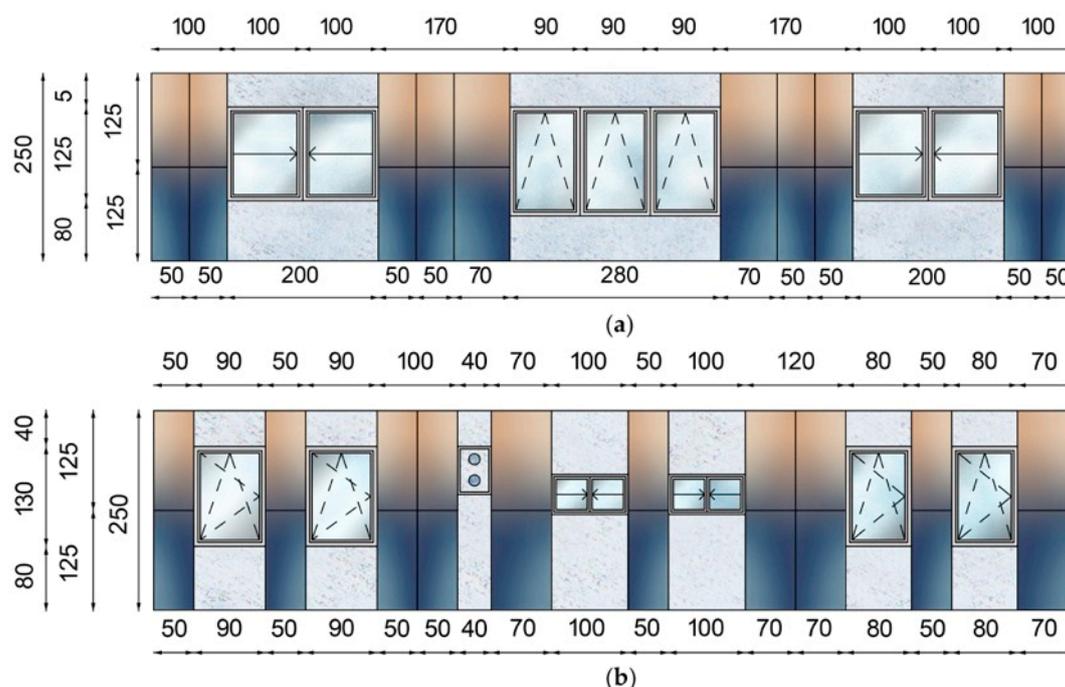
Enhanced building envelope system mounted on (a) south-oriented façade and (b) north-oriented façade (measures in cm).
